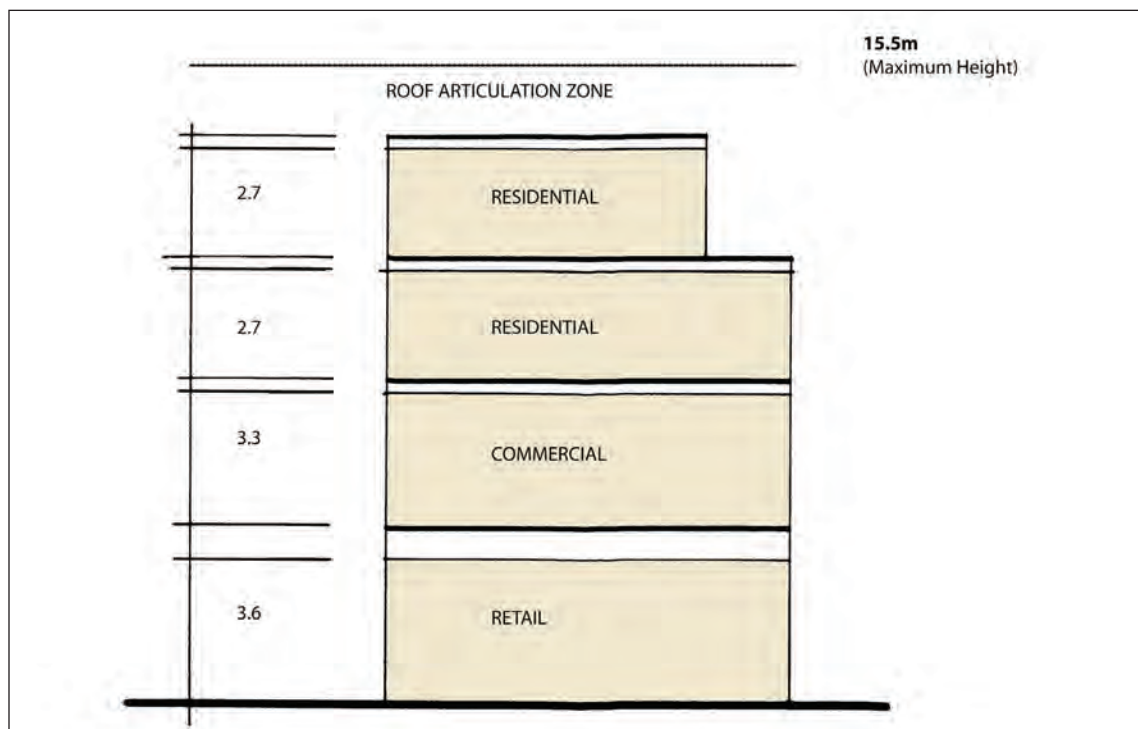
Minimum Floor to Ceiling Heights (Indicative)
